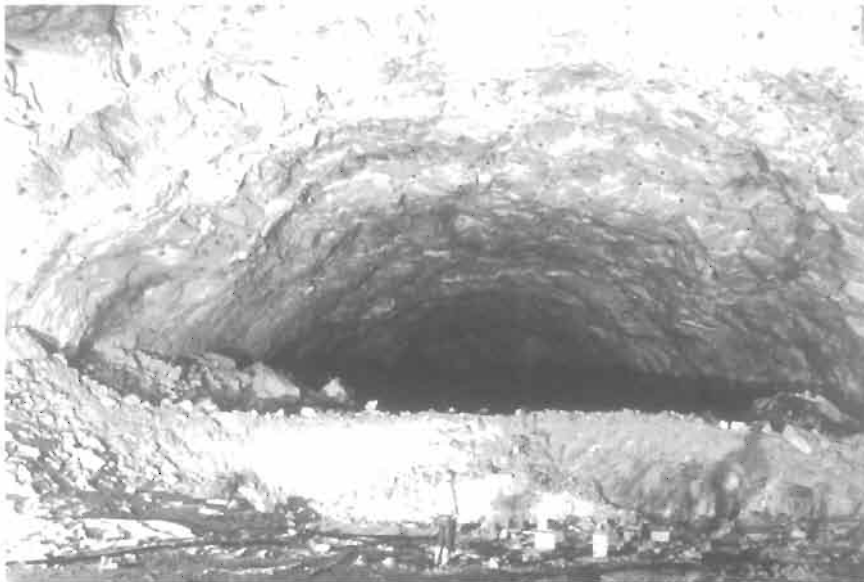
Construction of an underground excavation for a hydro-electric scheme.
